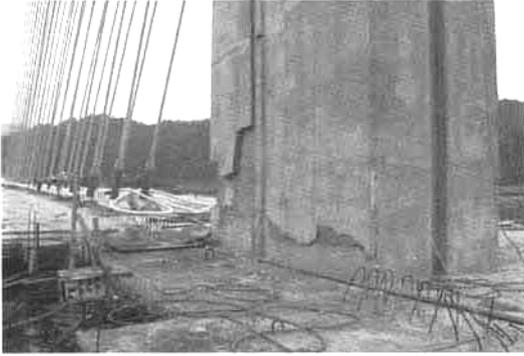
Concrete spalled off and horizontal cracks at the tower base
